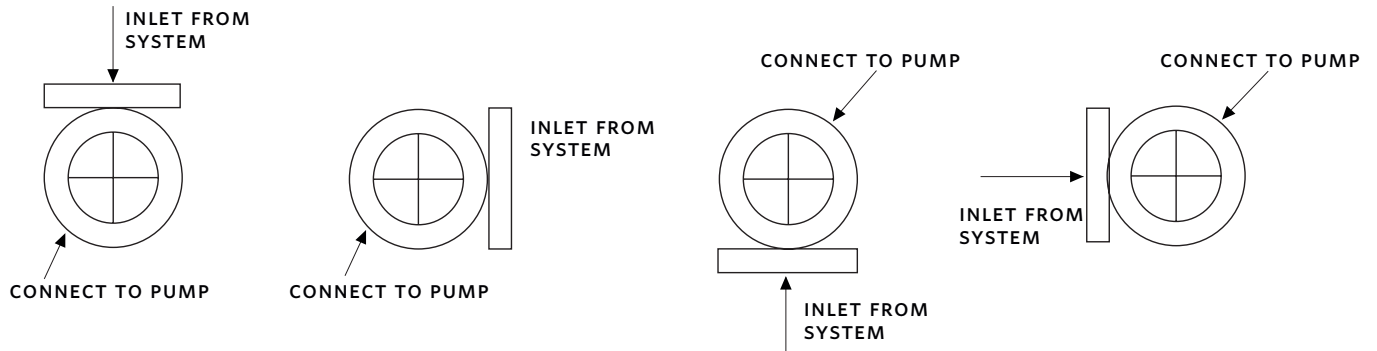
Armstrong Suction Guide may be installed in any arrangement feasible by pump flange boltholes arrangement.
